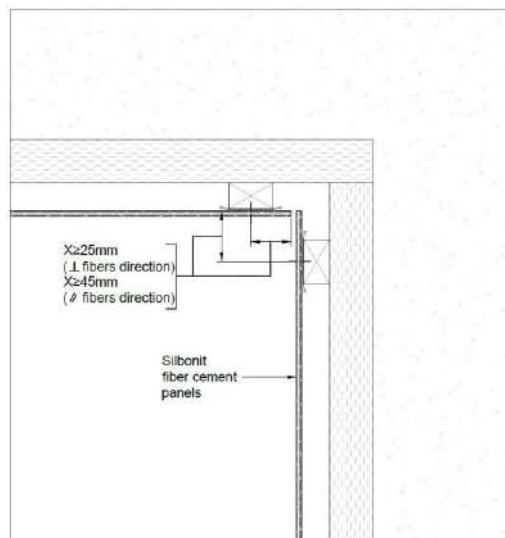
Example of a horizontal section of the ventilated facade package along an inner corner with an open vertical joint between the cladding panels. Wooden subframe.
